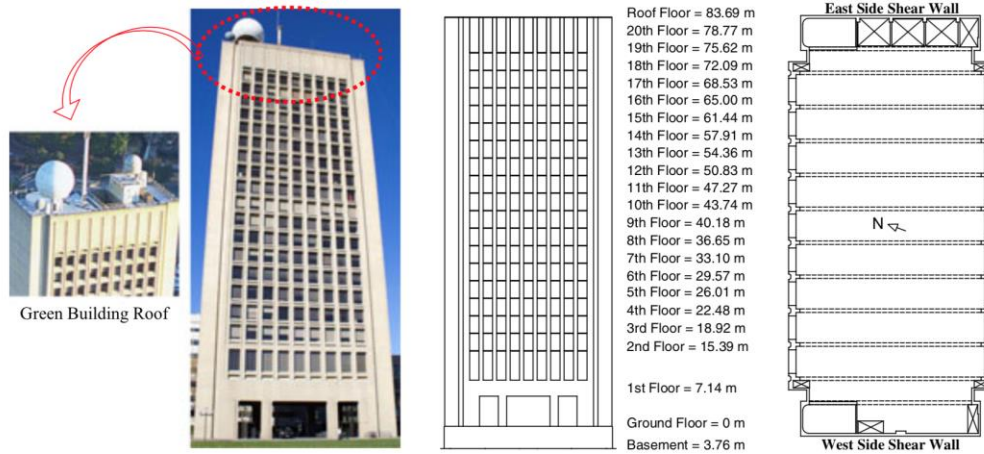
MIT Green Building at MIT in Boston, MA (the east/west sides are concrete shear walls), Sun and Buyukozturk (2018)
